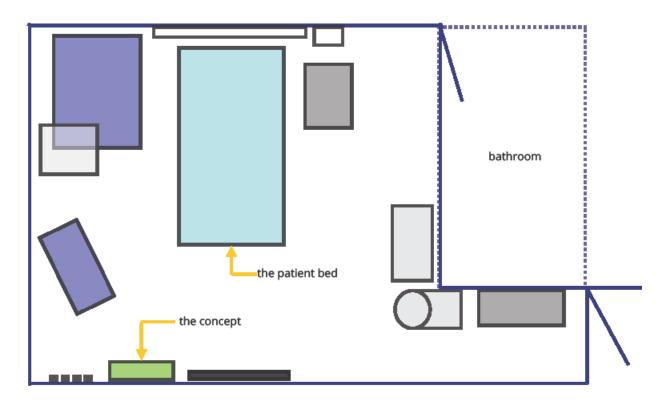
Floor plan of the patient room with De Verhalenhoek in it
